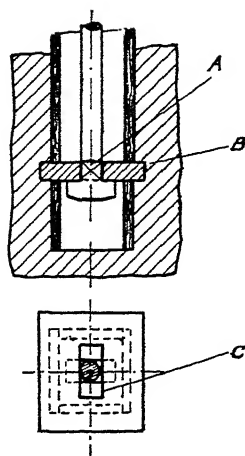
A SIMPLE TYPE OF REMOVABLE FOUNDATION BOLT
